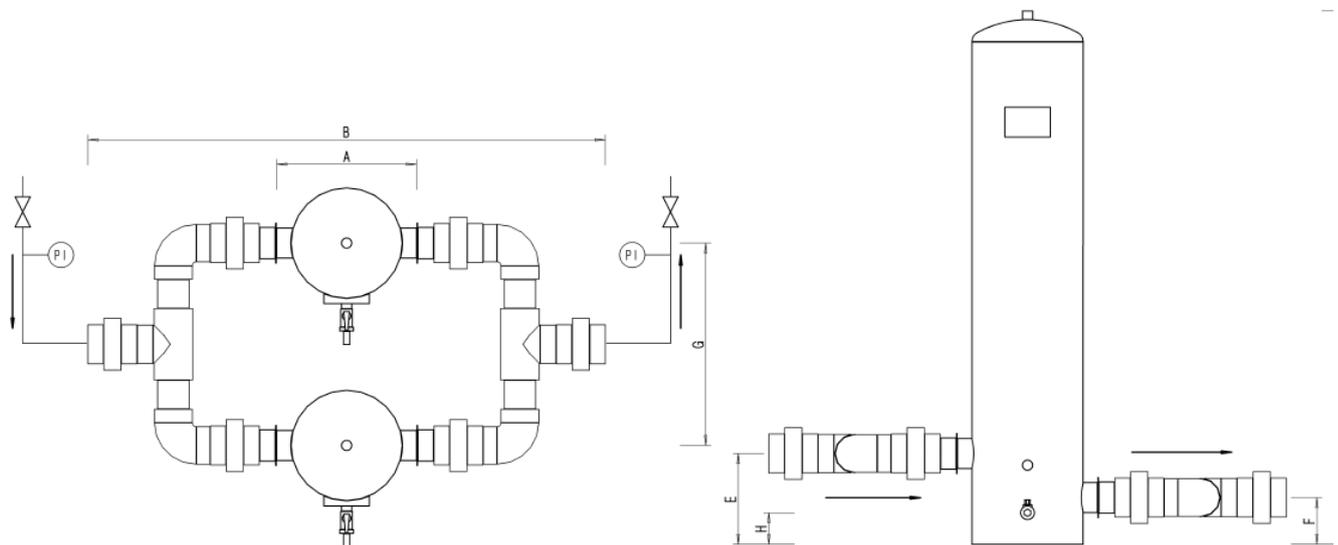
Installation/dimensional drawing of a GENO-activated carbon filter AKF 9000/12000
